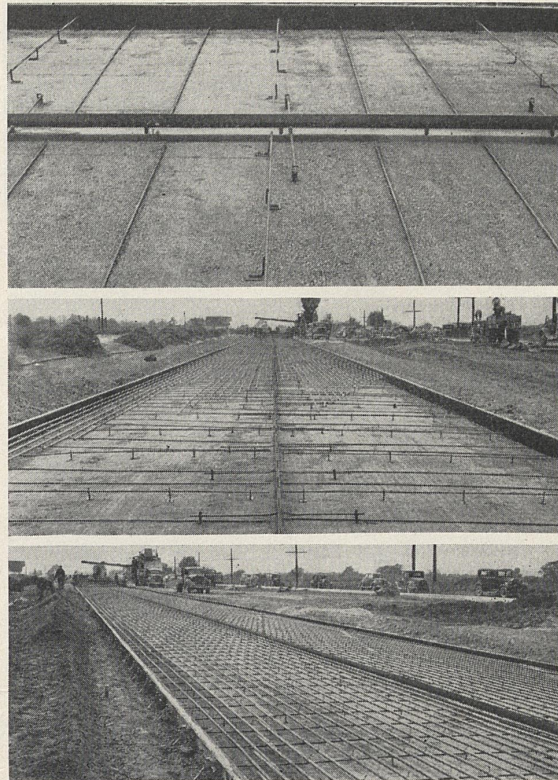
INSTALLMENT OF HEAVY BAR REINFORCEMENT. TOP, WELDED CHAIR SUPPORTS AND TRANSVERSE BARS BEING PLACED; MIDDLE, LONGITUDINAL AND TRANSVERSE STEEL BEING PLACED; BOTTOM, HEAVY BAR MAT REINFORCEMENT IN PLACE.
